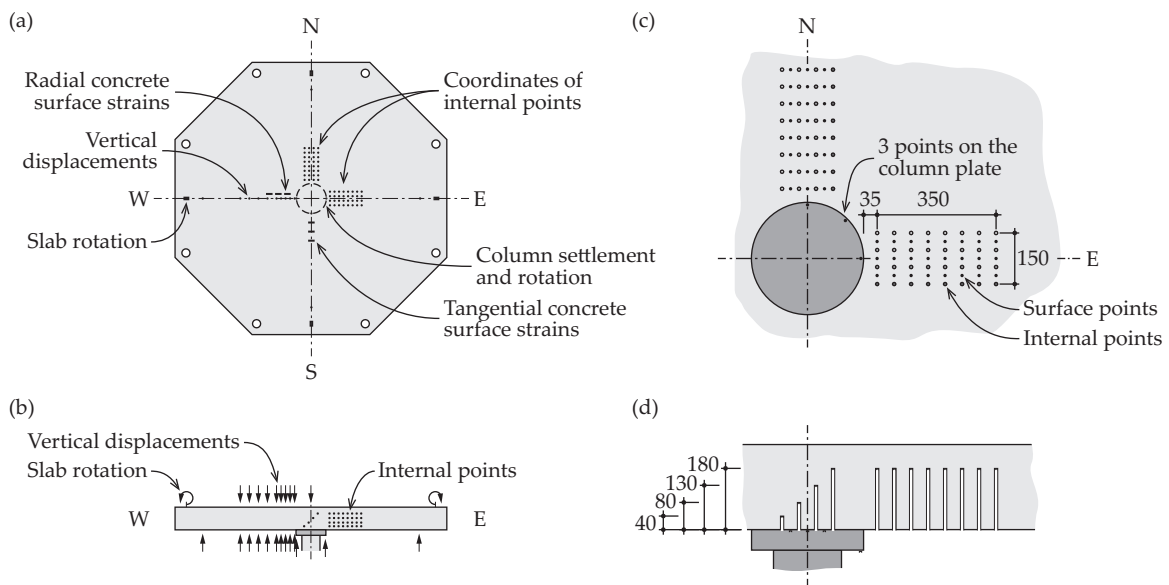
Instrumentation of the specimens: (a) plan view of the soffit of the specimen; (b) section view of the specimen (only LVDTs, inclinometers and internal points shown); (c) coordinate measurement points close to the column on the slab soffit; (d) section cut of the specimen through the internal coordinate measurement points
